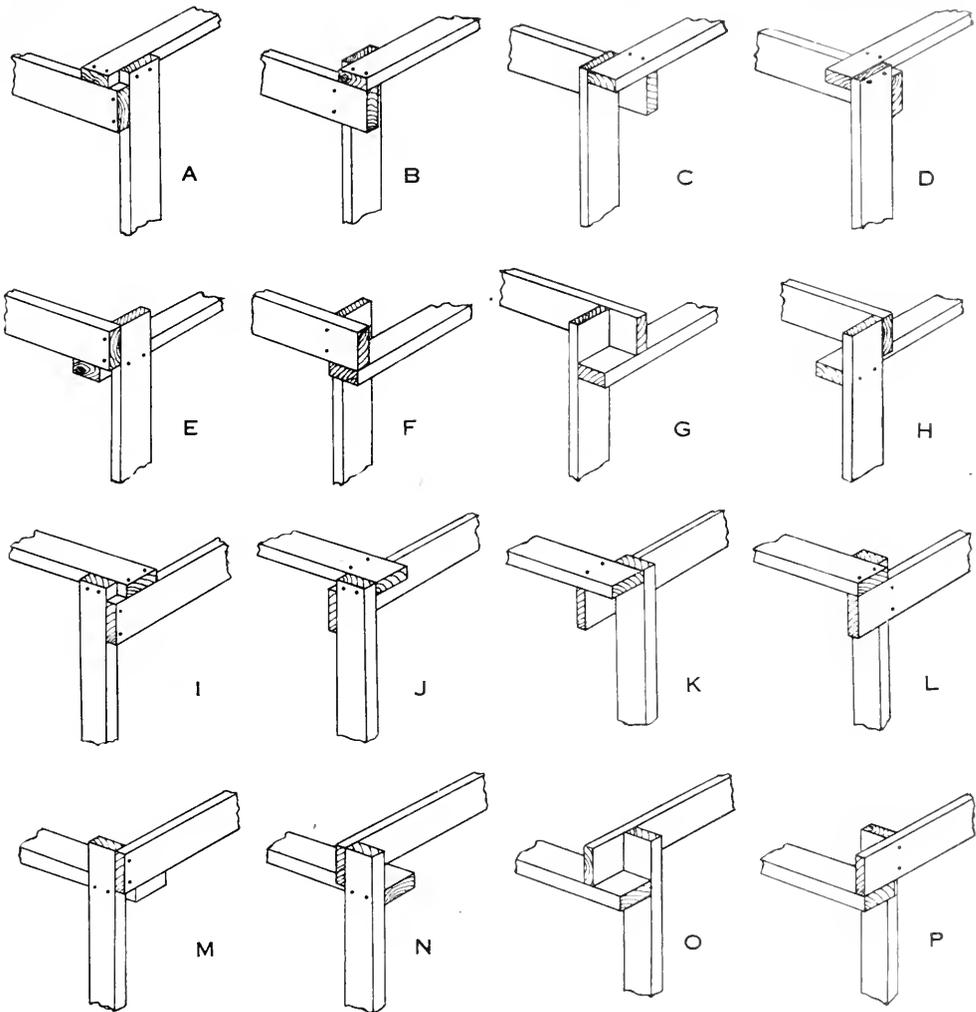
ARRANGEMENT OF MEMBERS AT 3-WAY CORNER
